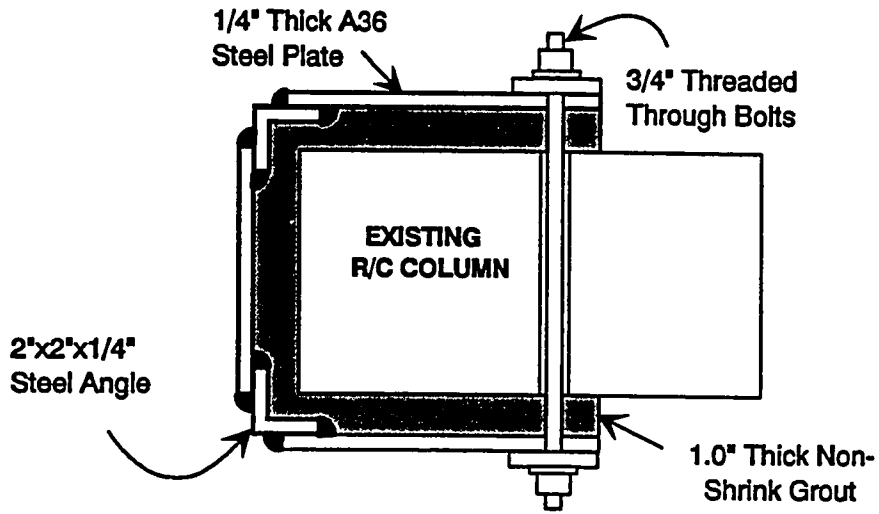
Details of 2/3 U-Shaped Partial Steel Jacket
